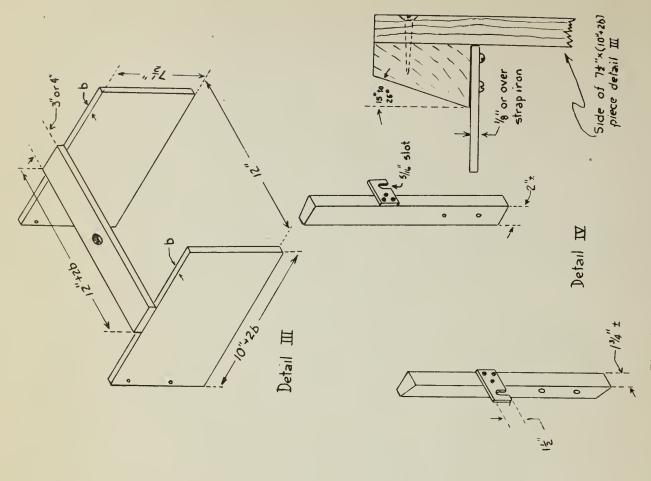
Wing walls and crosspiece (detail III) and the tapered-edge strips (detail IV) that form the seal on the edge of the bulkhead.
